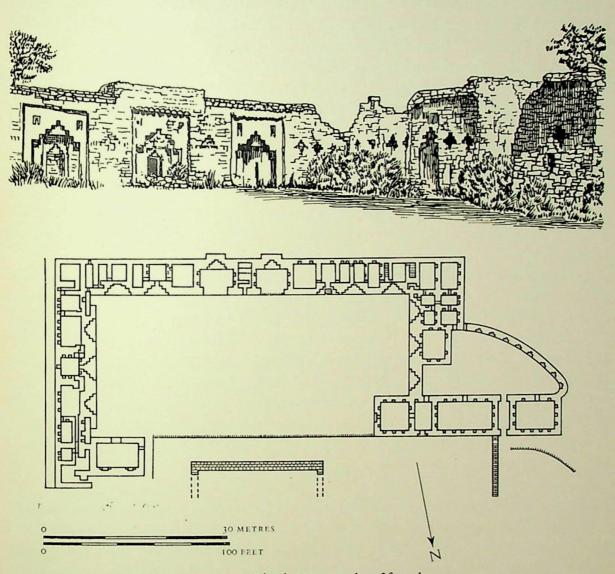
Coati Island, Nunnery, late fifteenth century. Elevation and plan
